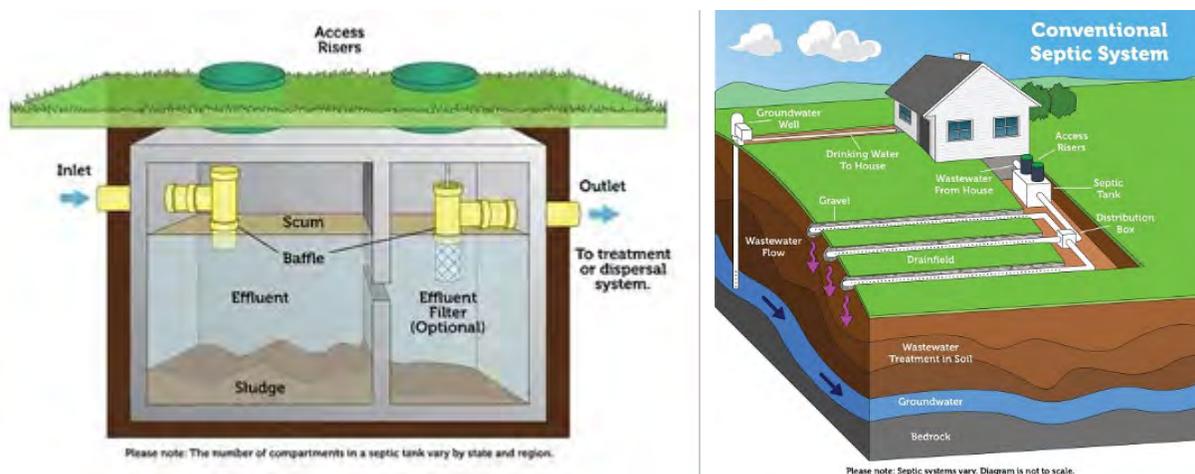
Septic tank elevation view (left) and a conventional septic system (right) source: EPA
